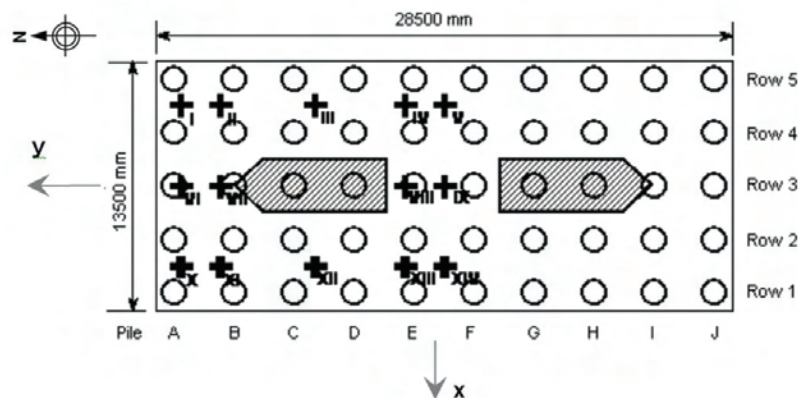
Plan view of the pile cap showing pile notations and the proposed location of trestle legs (denoted +) of the steelwork
